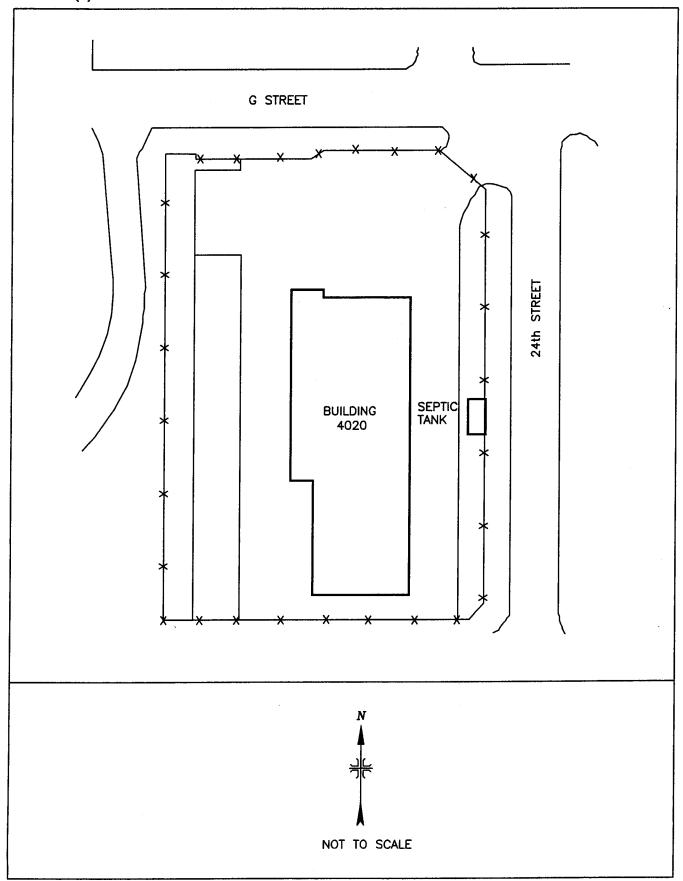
Hot Laboratory (4020) - Plot Plan
